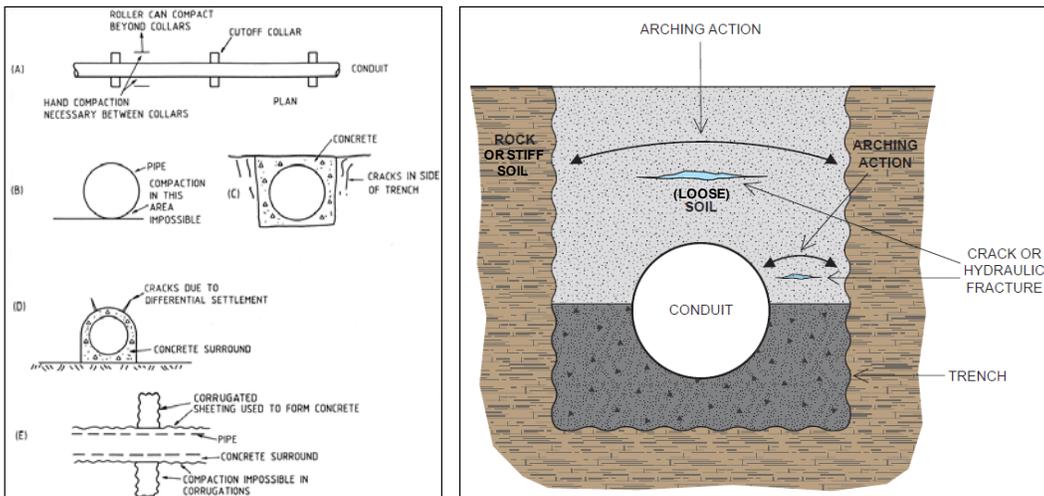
C-15.—Some causes of piping failures around conduits (Fell et al. 2008).
